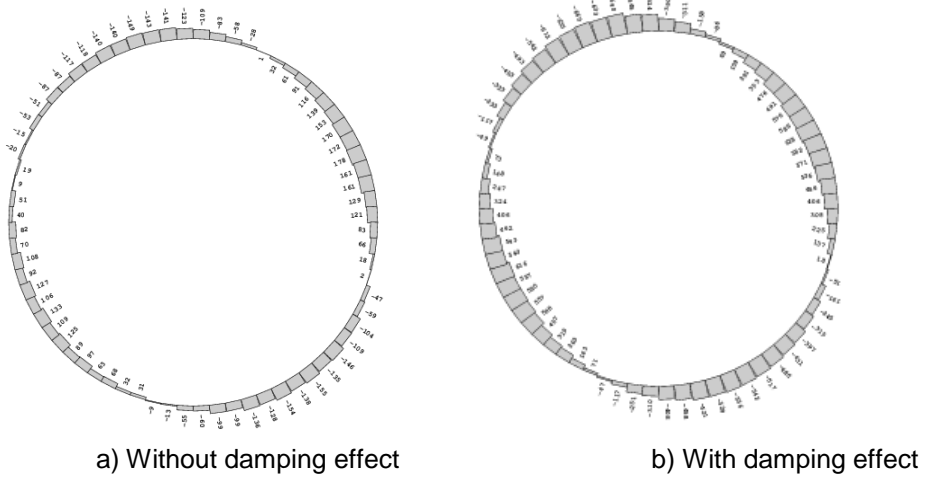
Shearing forces in tunnel lining after 6.9 sec.
